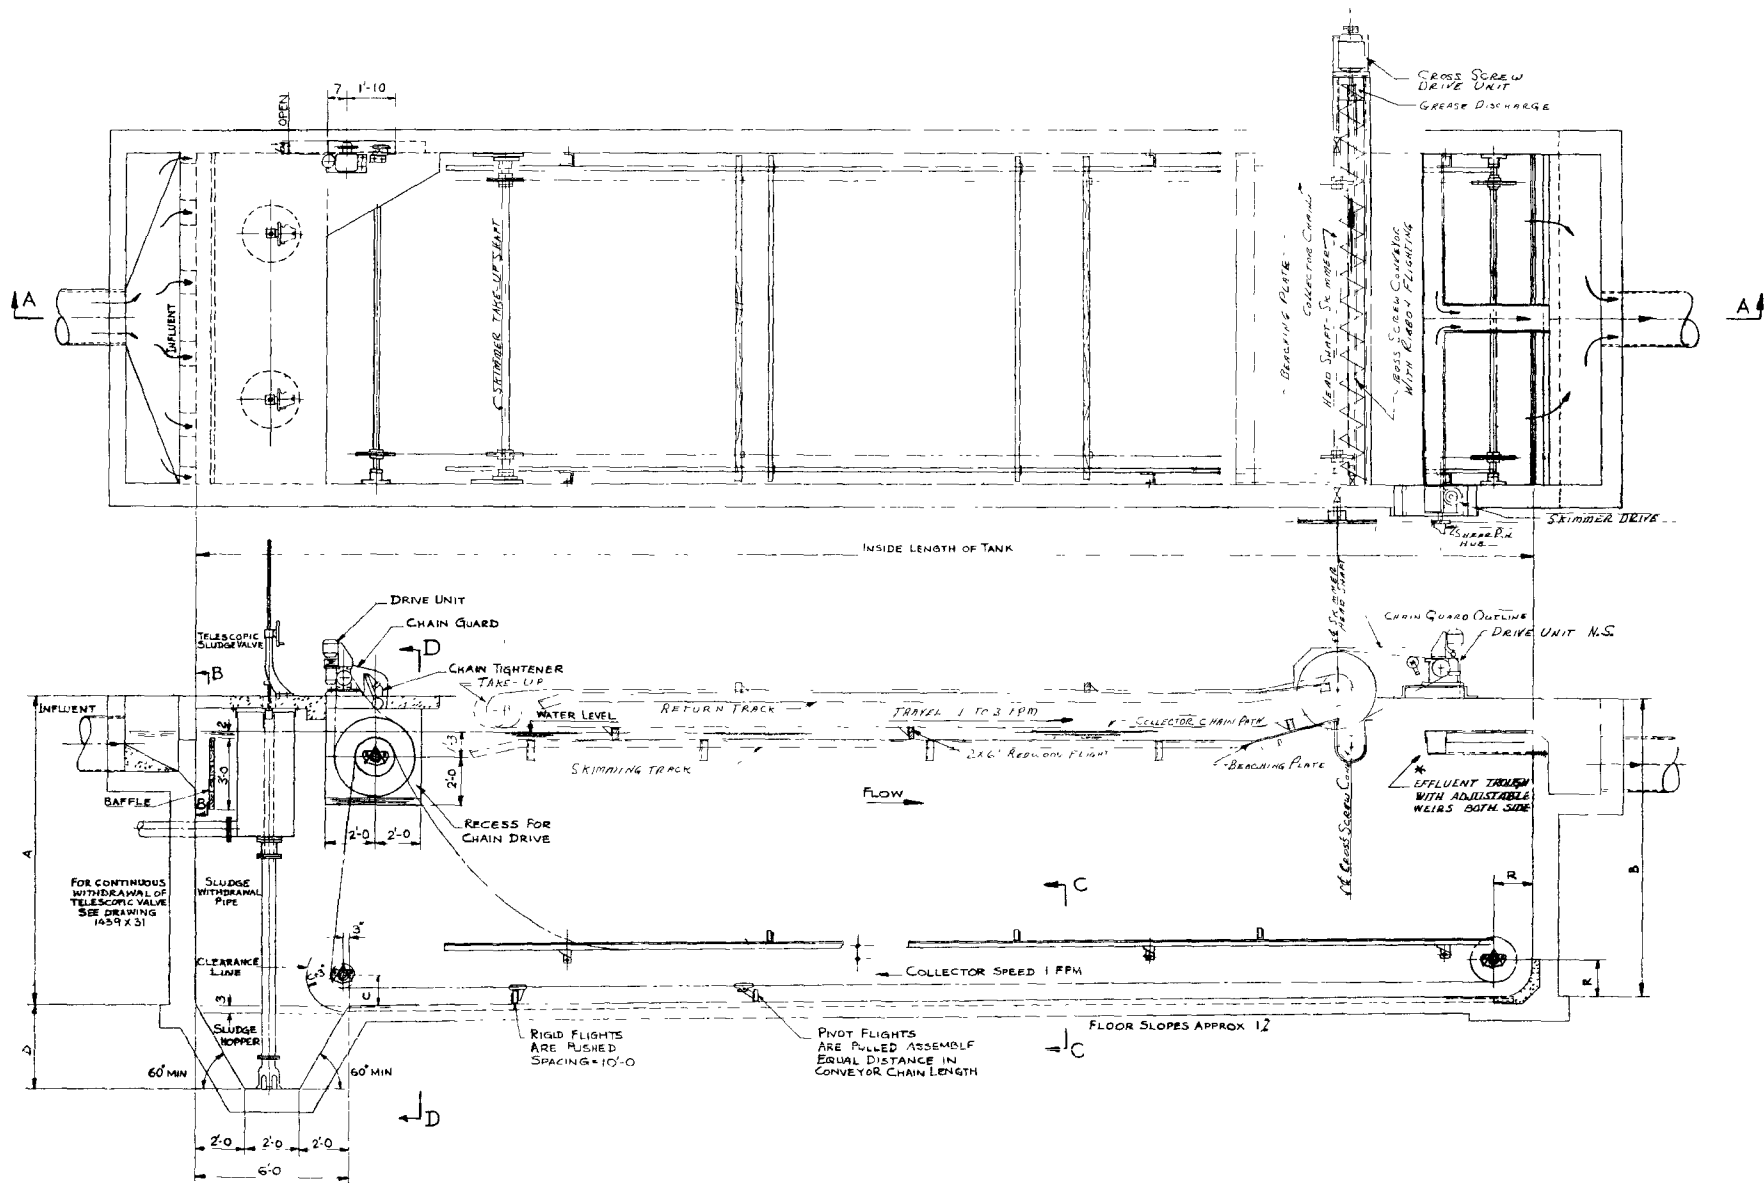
Three-sprocket collector with flight skimmer full length and cross screw conveyor. (Courtesy of the Link-Belt Company.)
